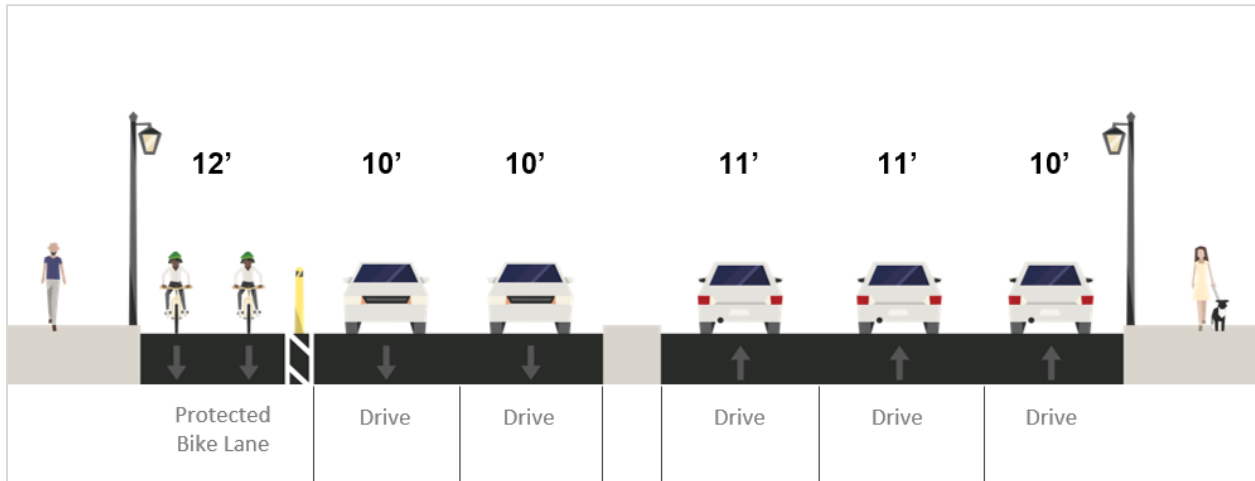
Typical section view, proposed condition; New Hampshire Ave NW to G St NW
